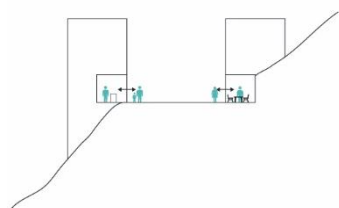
Commercial use ground floor (Safe Nepal group 1).
